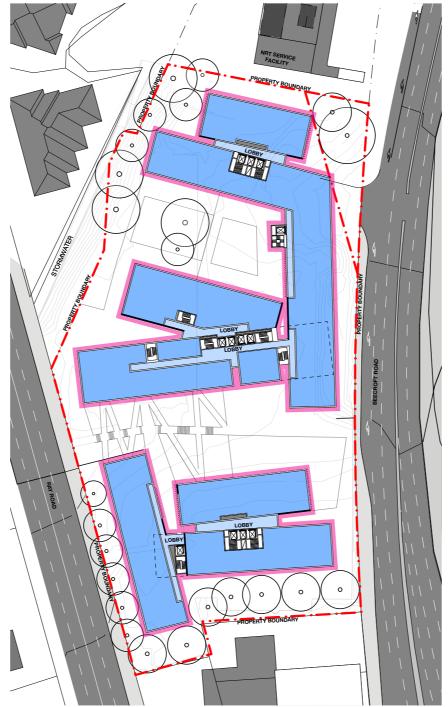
, Indicative Level 1-4. Amended and approved Design Report, 19.03.20, Bennett and Trimble
